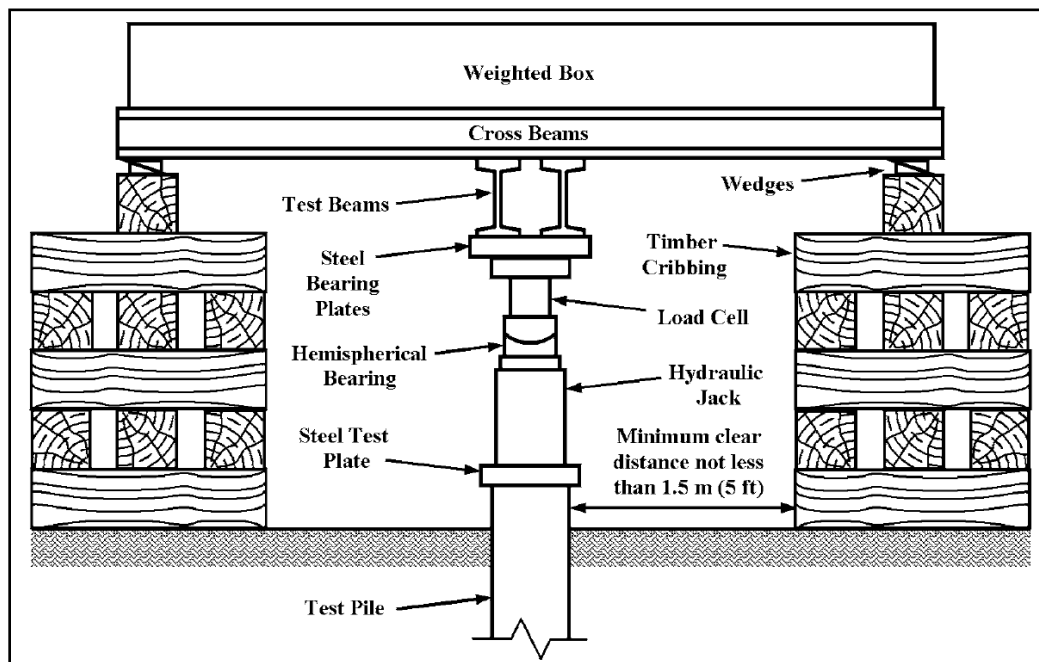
Schematic hydraulic jack acting against weighted box or platform in a typical setup for compression load test (ASTM D1143M – 07).
